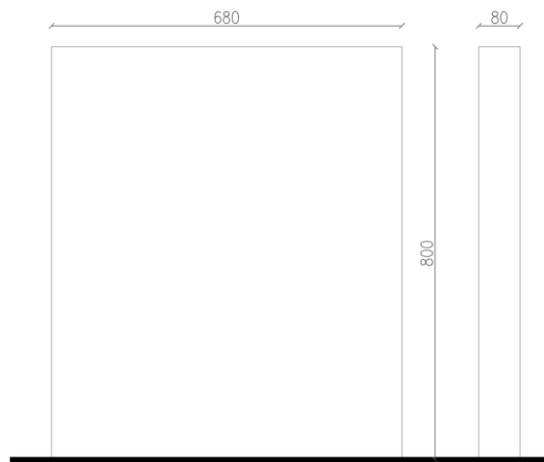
Wall Panel Finalised dimensions (in mm)
